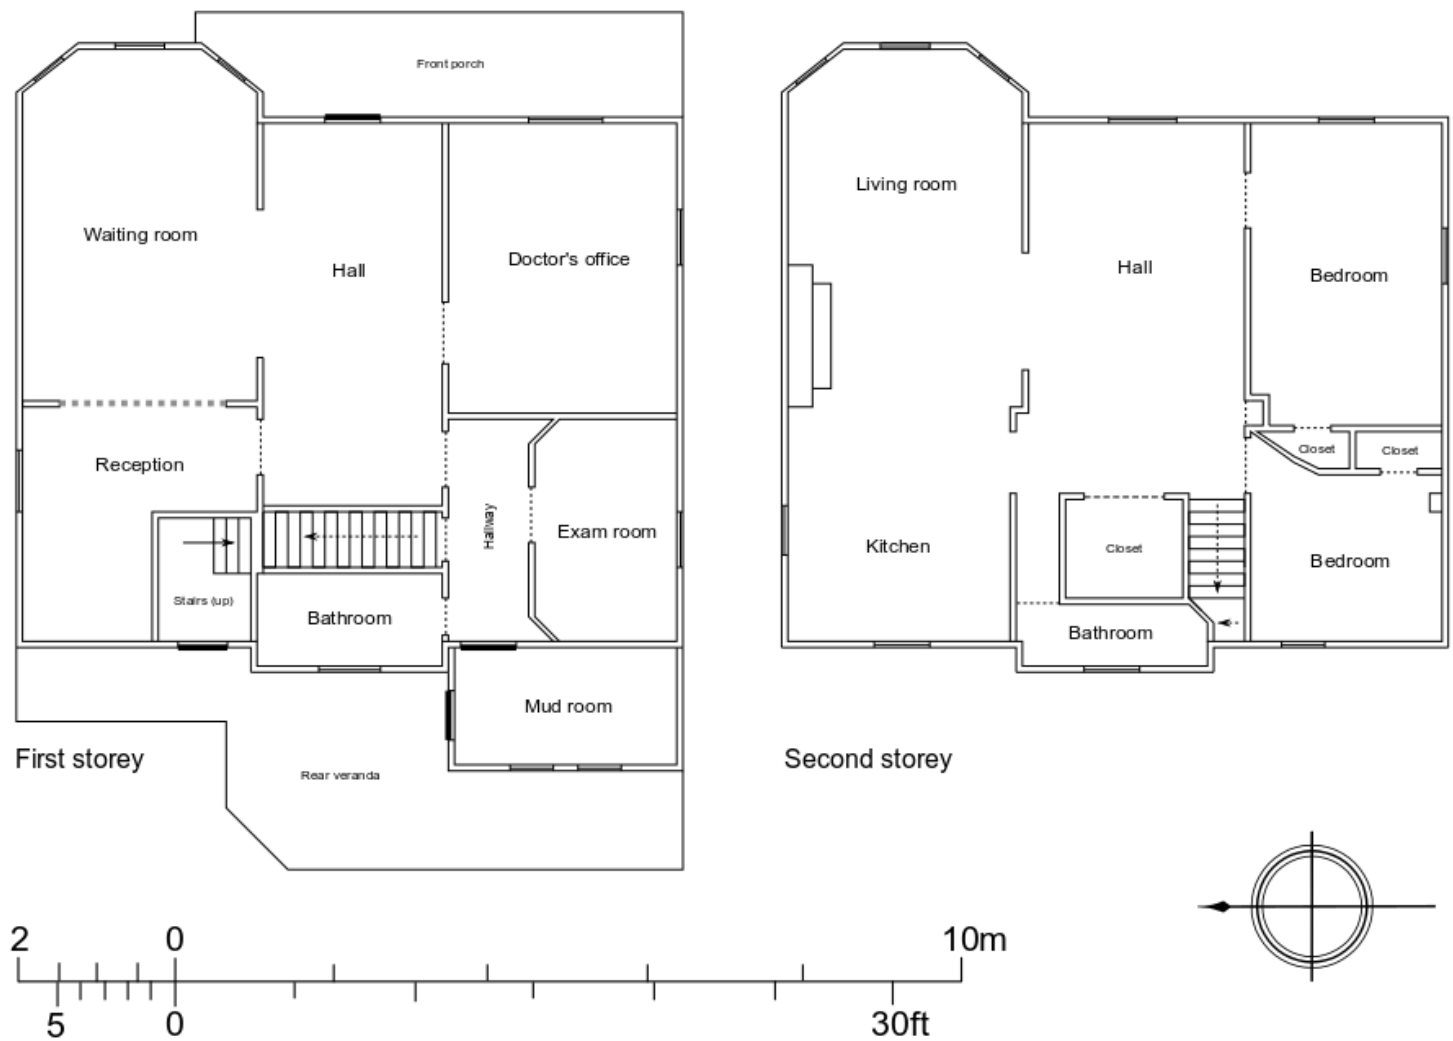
Interior floorplan of 276 Ste. Marie Street. Scale is approximate.
